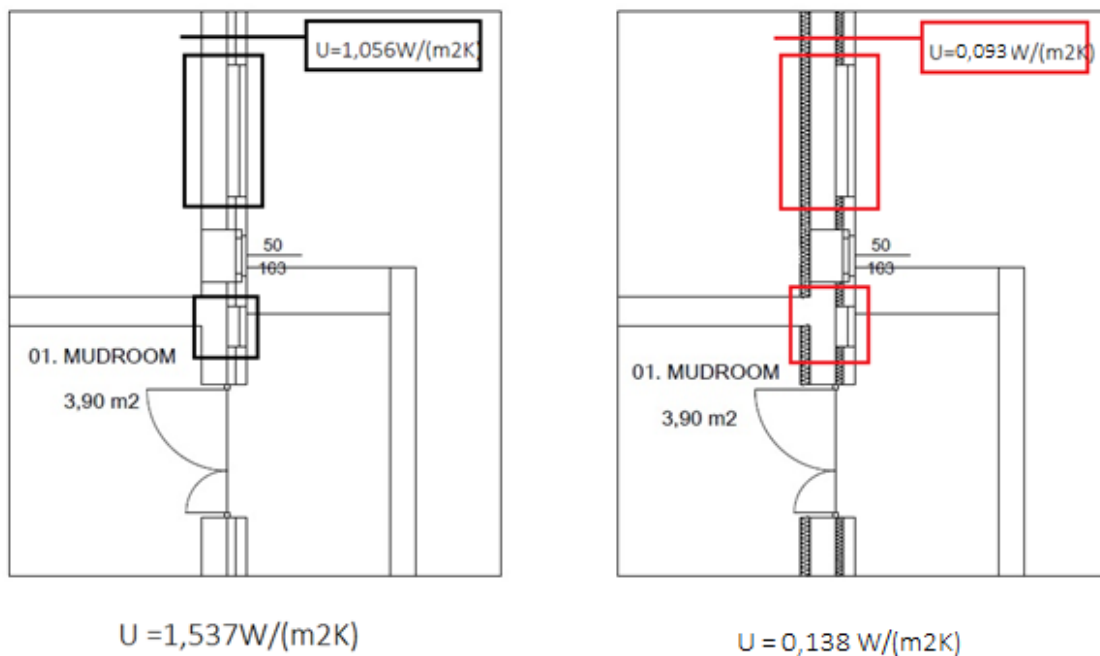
Part plan of west exterior wall before (on the left) and after (on the right) termomodernisation.
